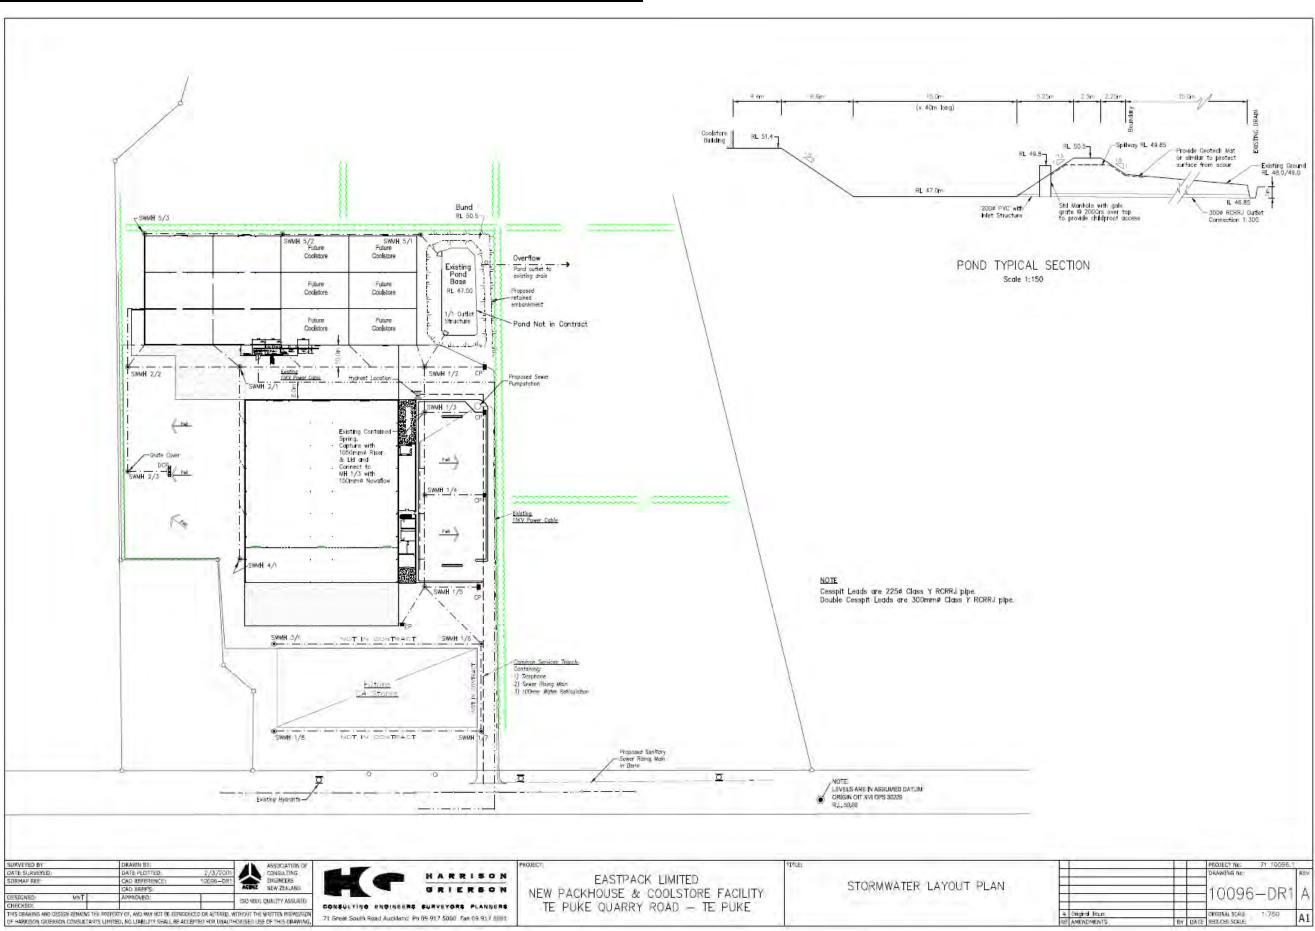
EastPack Ltd stormwater layout and pond details (source: Harrison Grierson, 2001)
